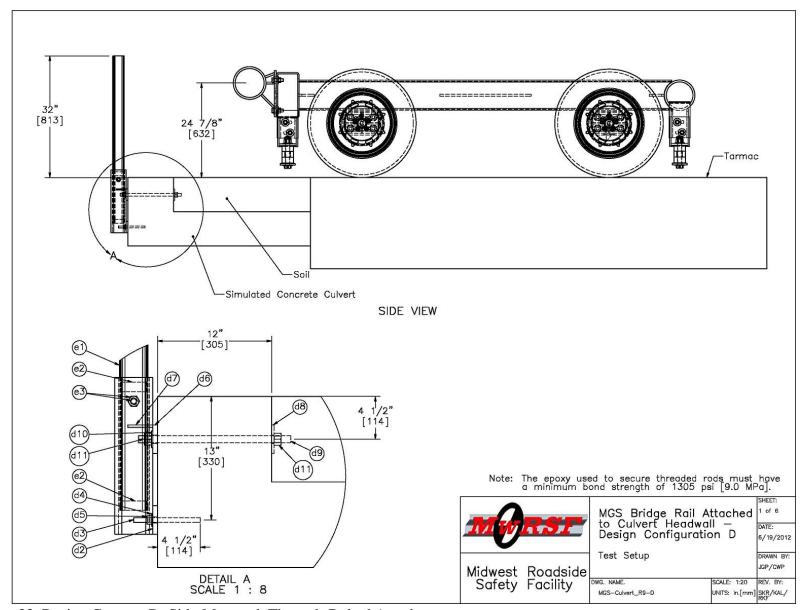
Design Concept D: Side-Mounted, Through-Bolted Attachment
